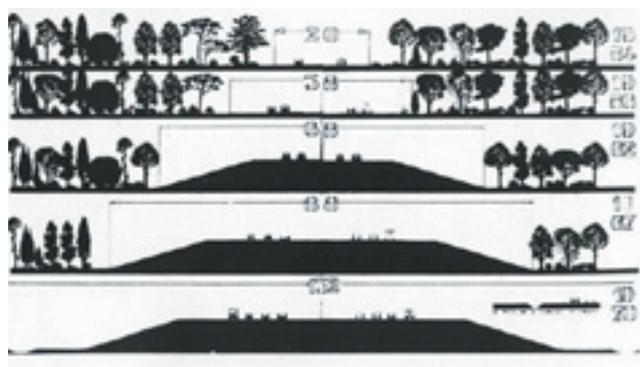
Successive plans for the A27 section east of Utrecht 1954 – 1970 (source: Grimbergen 1983)
